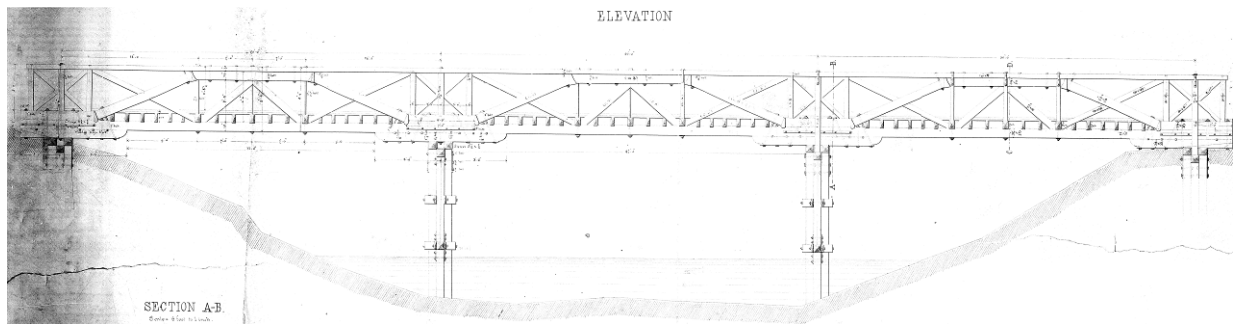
Bennett's Camden Bridge, 1860 (50' Spans)
